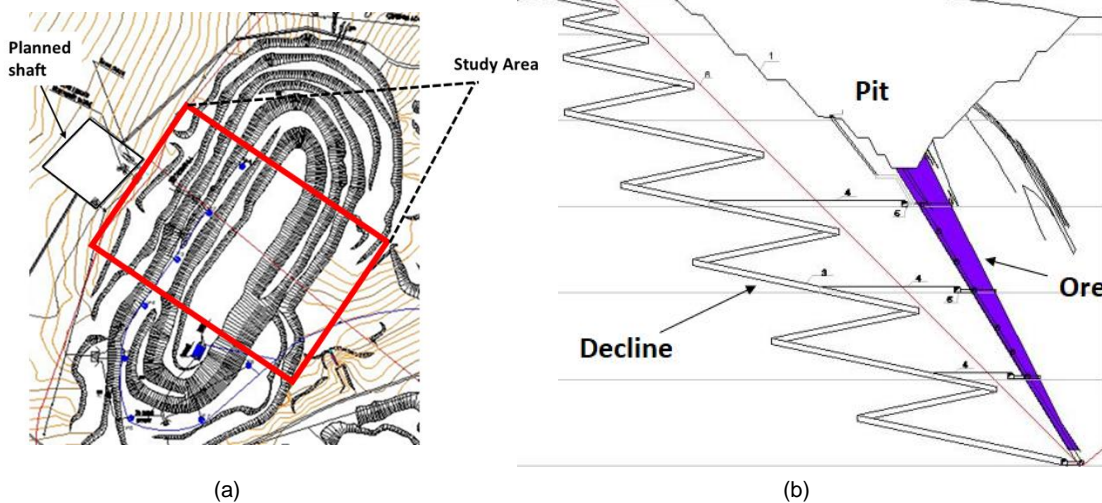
Cross section of study area (a) Plan view of the study area (b) Cross section
